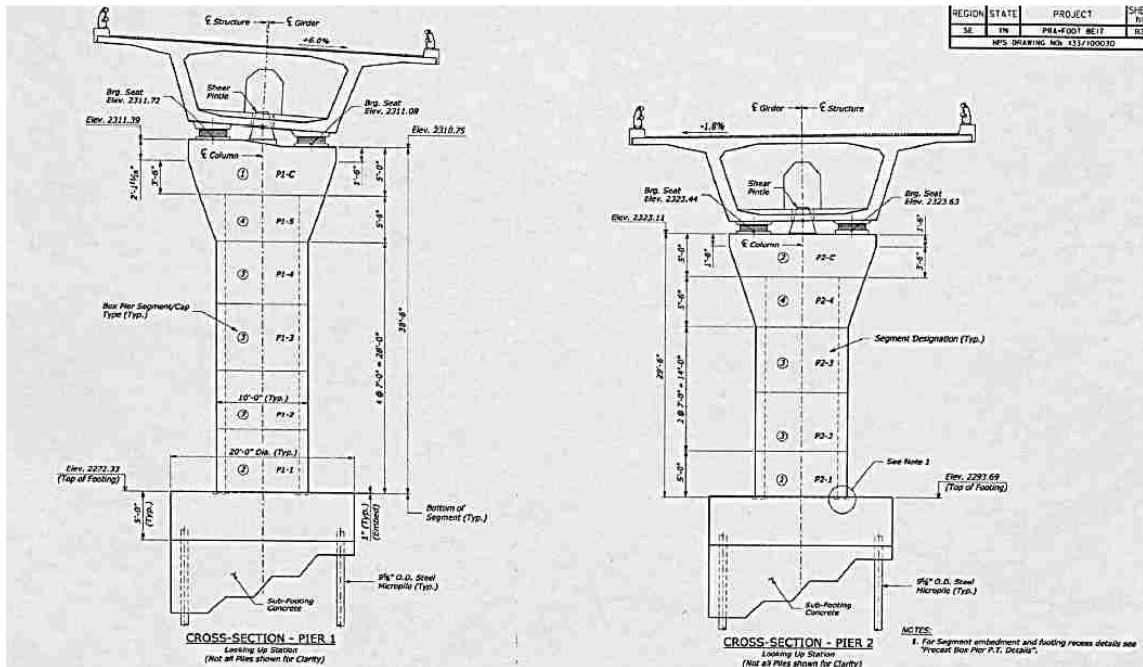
Column Segments Construction (Corvern Engineering, 2010).
